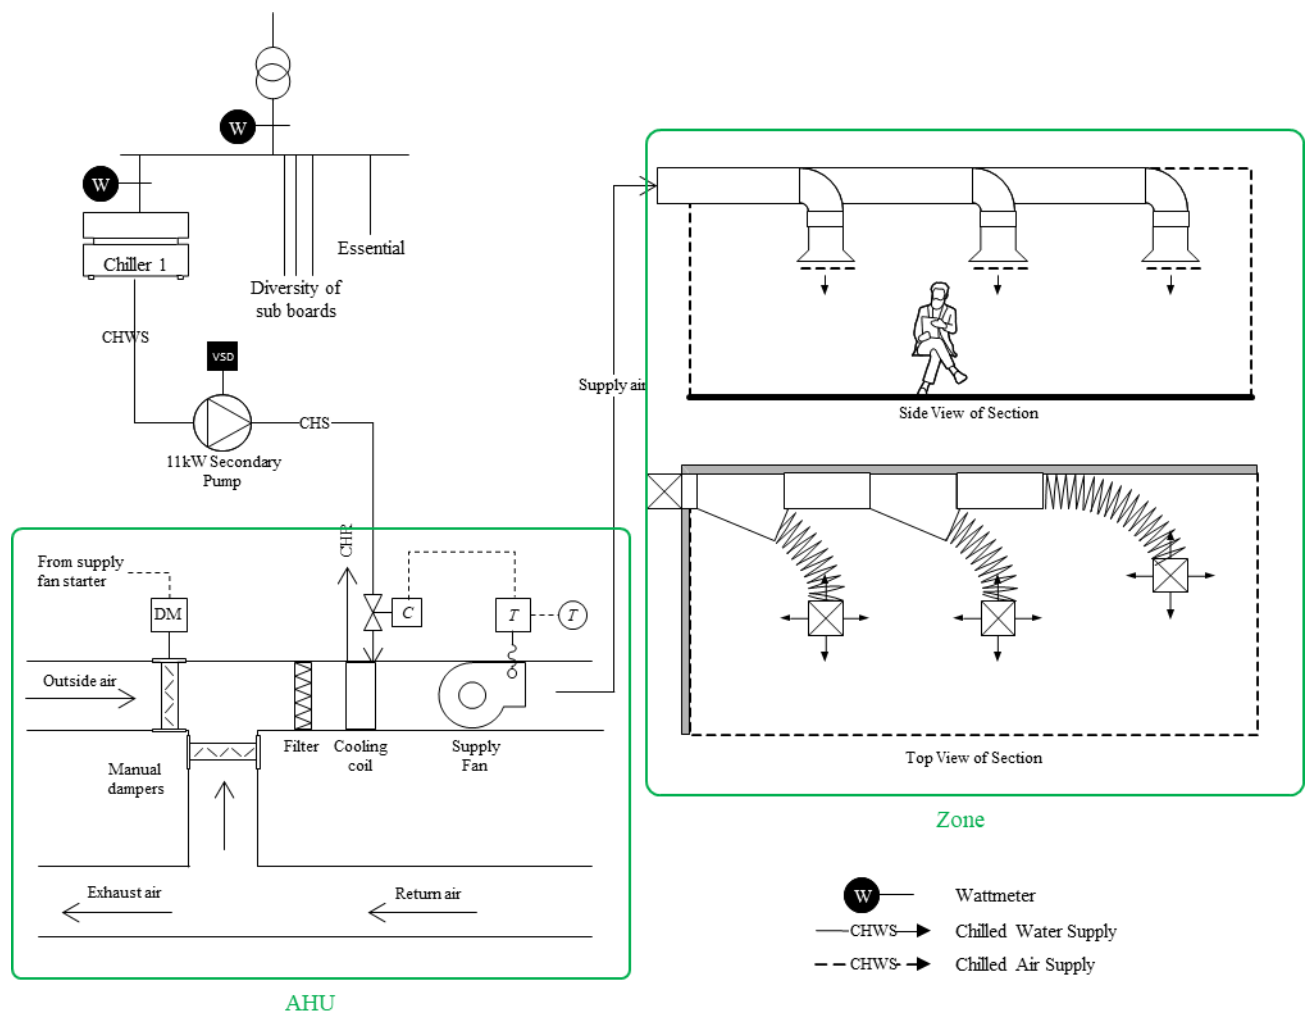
Simplified Reticulation Diagram and HVAC Layout
